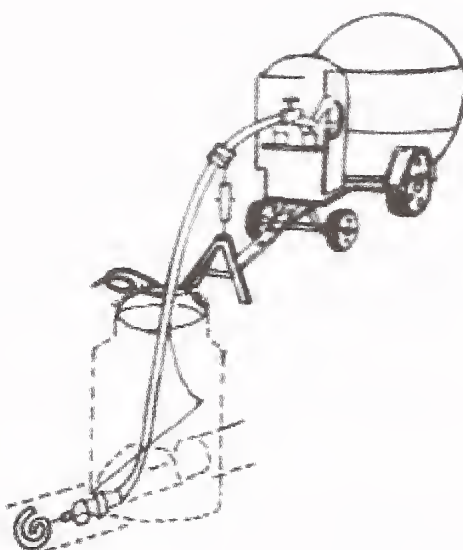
Rodding Machine with Flexible Sewer Roads
